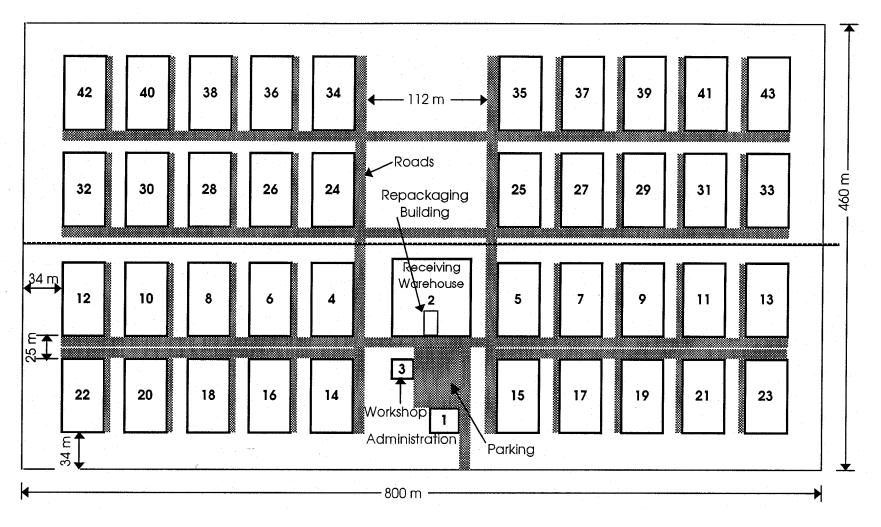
Site Layout of the Vault Storage Facility — Uranium Metal, Base (100%) Case
